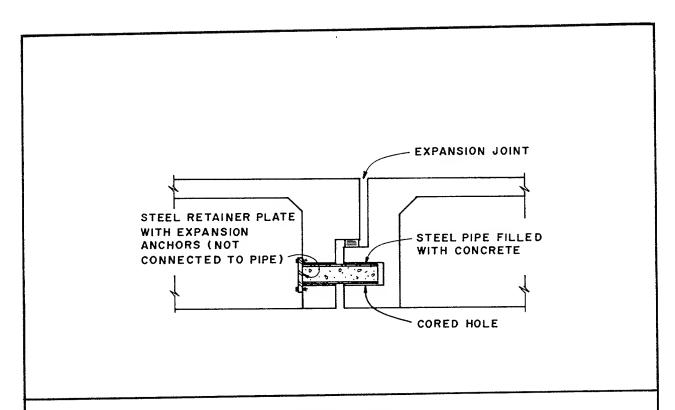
Transverse Restrainer Retrofit for Concrete Bridge (from Reference 5)
